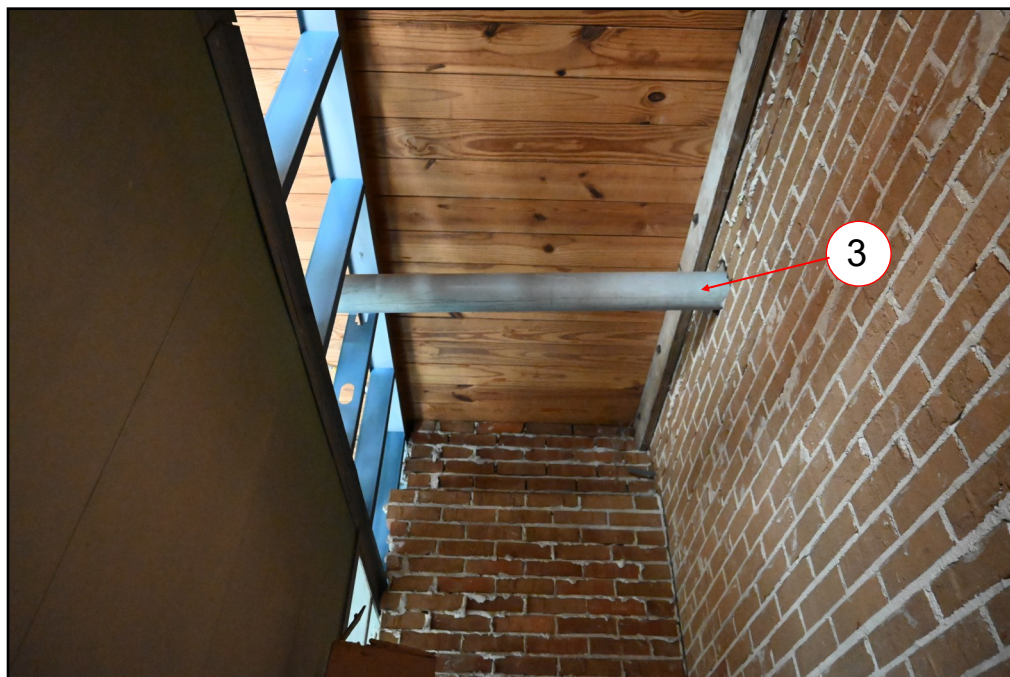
Penetration point of 4" PVC conduit at FAA Avionics Building exterior
